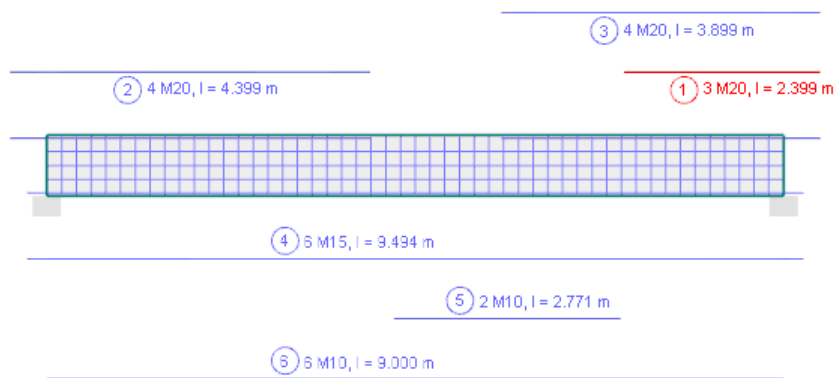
Reinforcement drawing in Window 3.1 *Provided Longitudinal Reinforcement
